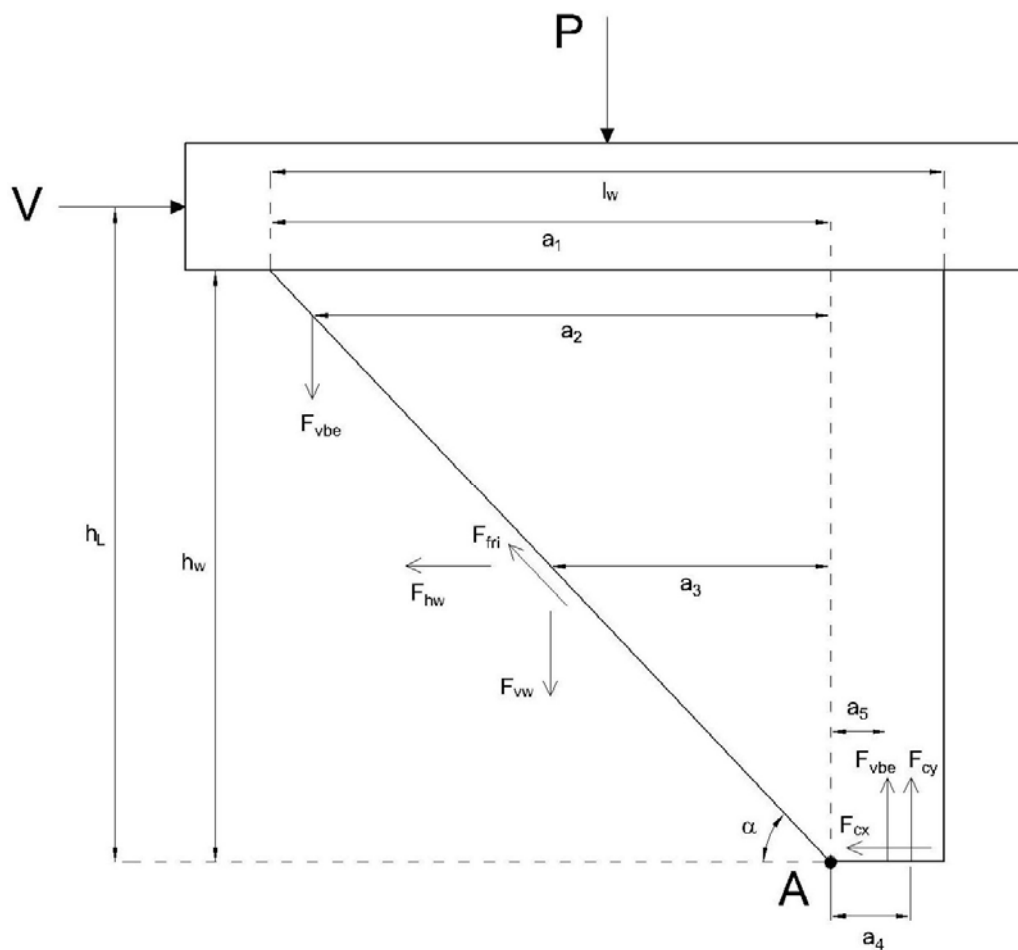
Free body diagram of a reinforced concrete squat wall following the occurrence of a inclined crack
